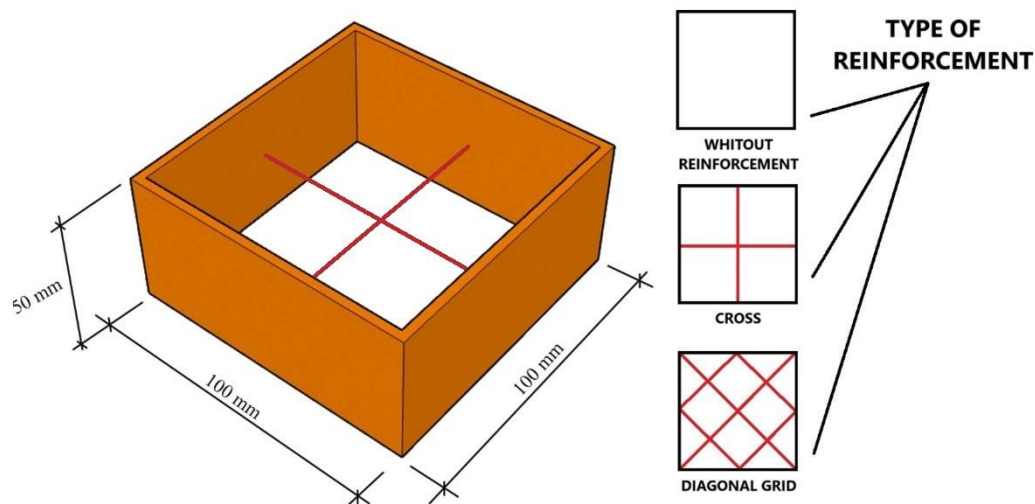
Dimensions of the reinforcement element for 100x100x50 mm specimens and shapes of internal reinforcements.
